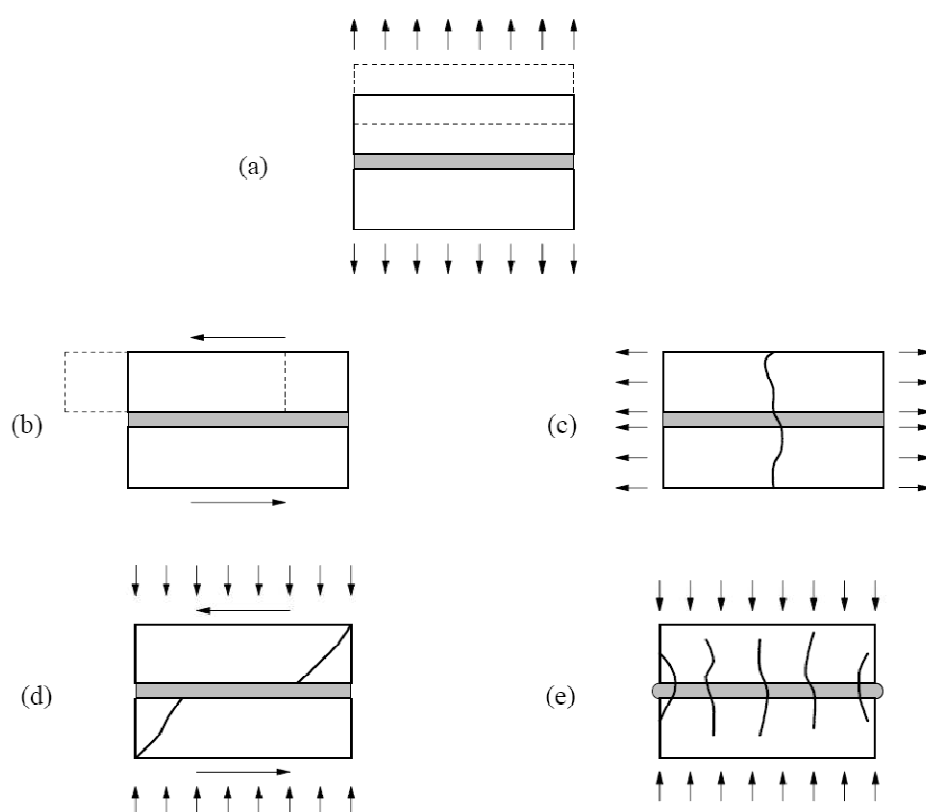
Masonry failure mechanisms: (a) joint tensile cracking; (b) joint slipping; (c) unit direct tensile cracking; (d) unit diagonal tensile cracking; (e) masonry crushing.
